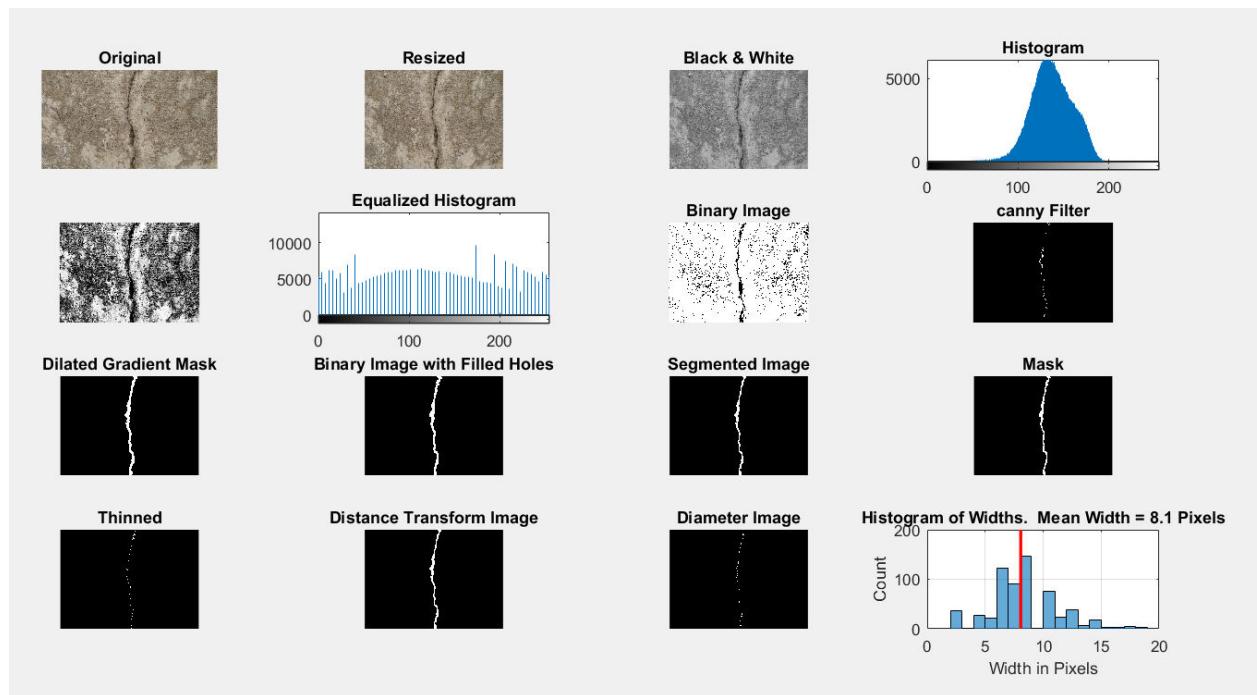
WHITE BOX TESTING ON GUI (IMAGE 3)
